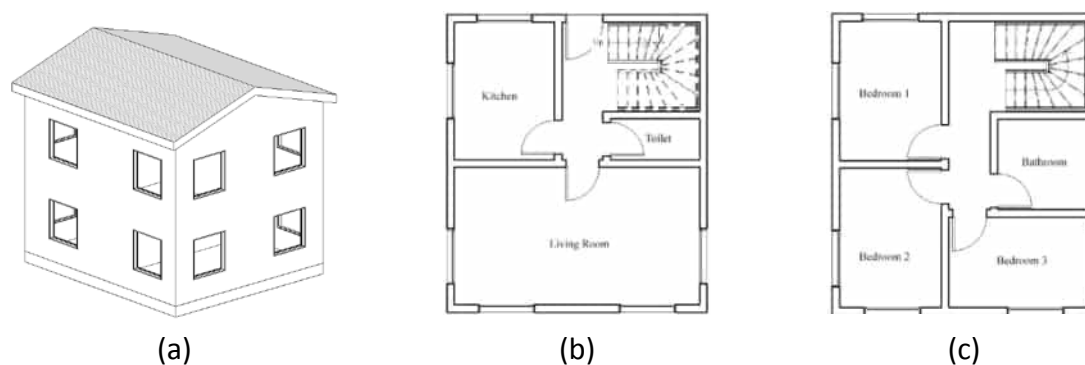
Building appearance and floor plans (a) Perspective view (b) Ground floor (c) First floor
